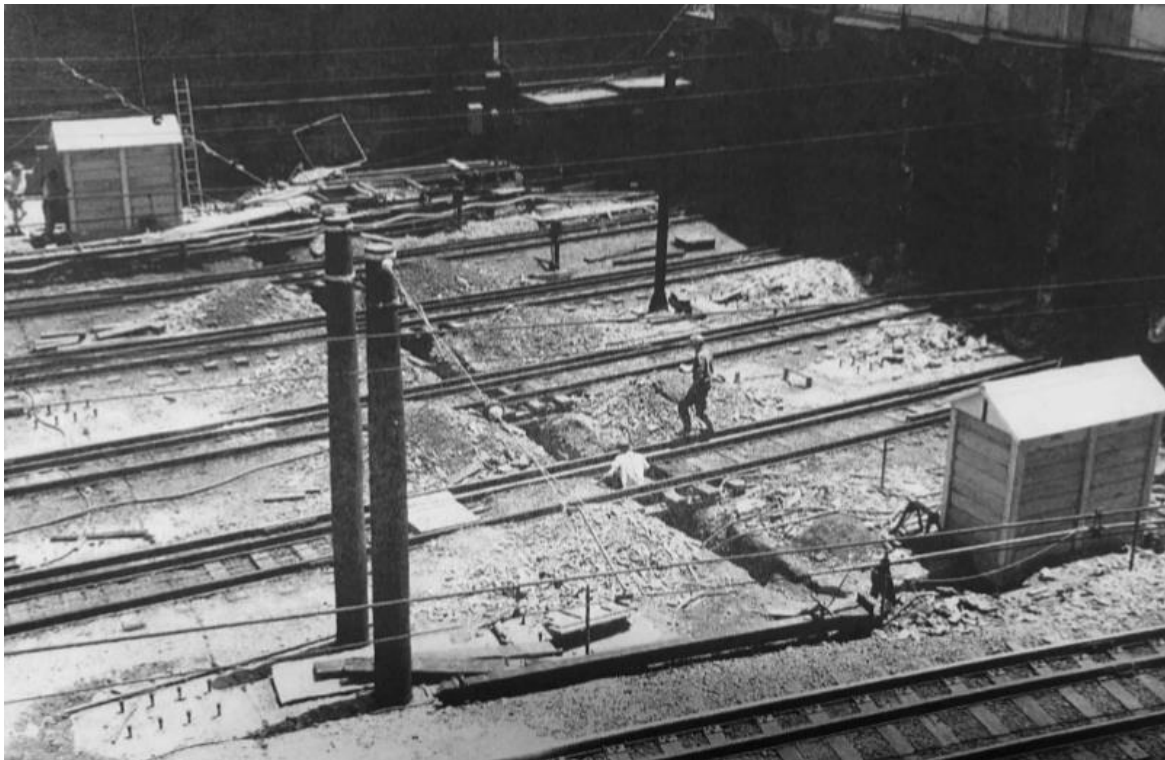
Looking towards the Goulburn Street portals of the underground during construction of parking station over the tracks, 1961¹²⁵
